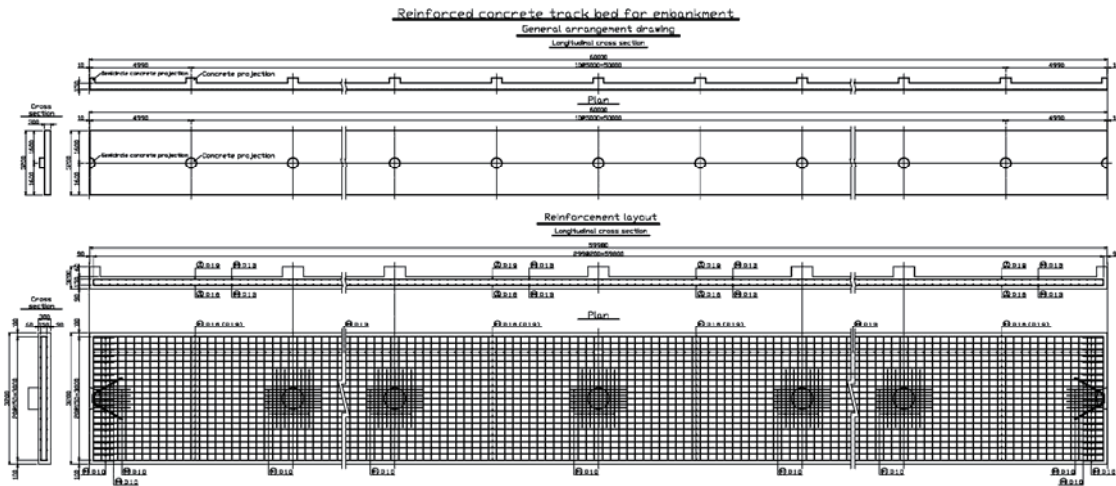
Reinforced Concrete Track Bed (Embankment Section)
